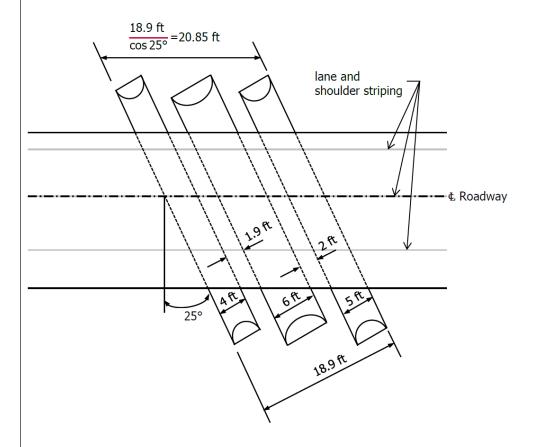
Plan view of a skewed, multi-pipe culvert under fill.
